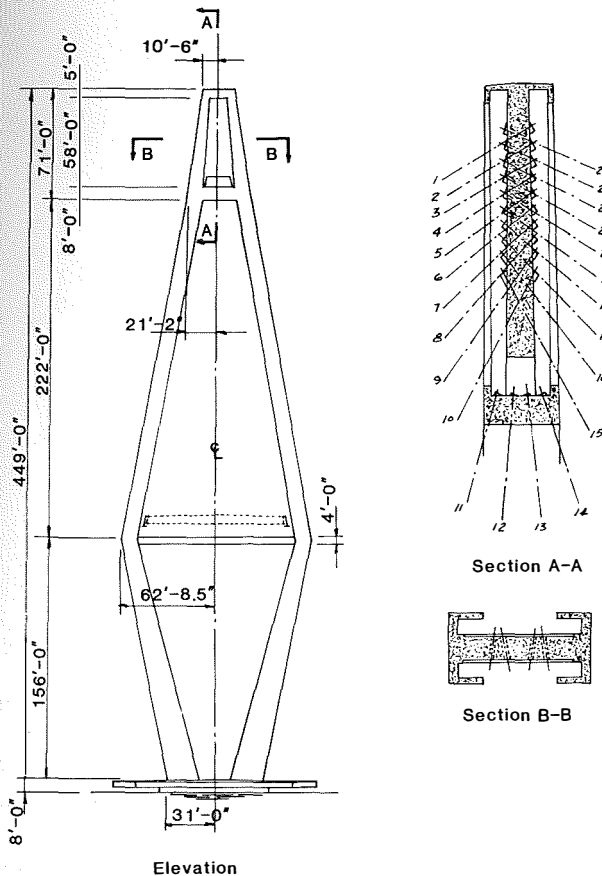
Sunshine Skyway Steel Alternate, pylon.
